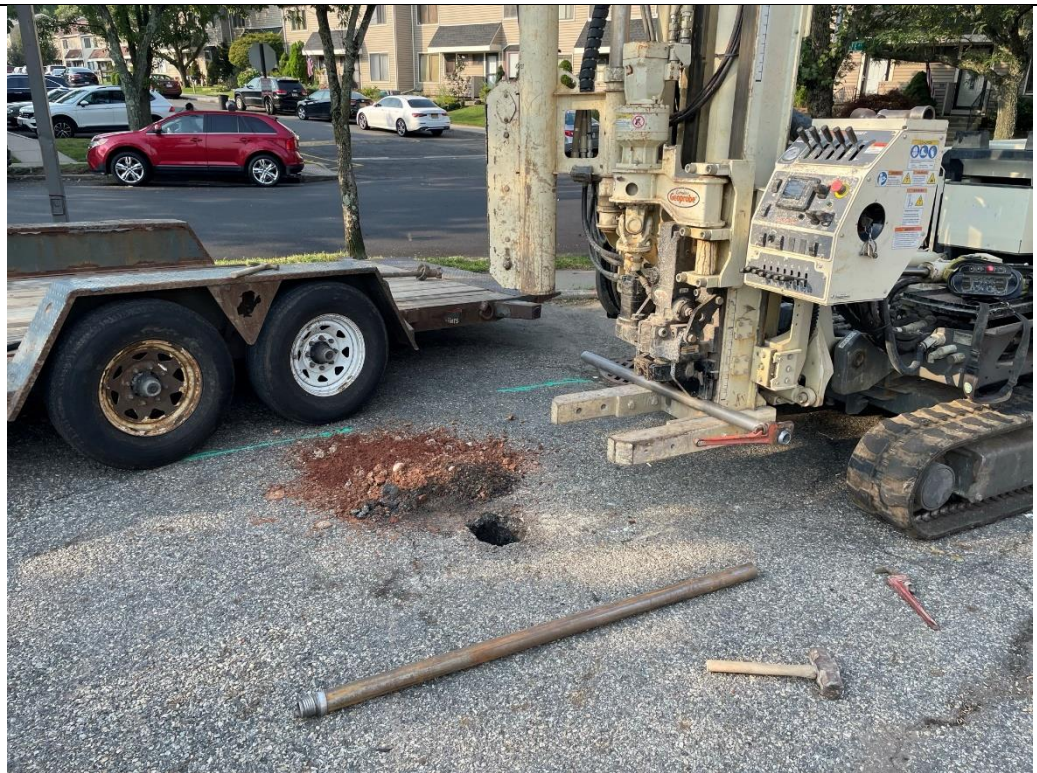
View of completed installation of LMW-11A within the southern portion of the site, facing north.
